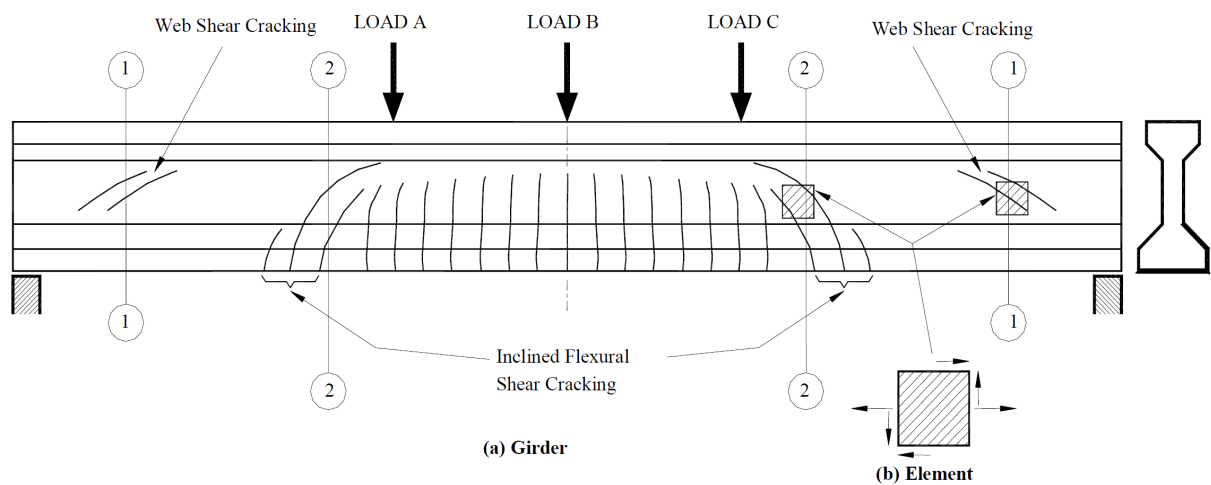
Shear Failure Modes in I-Girders
